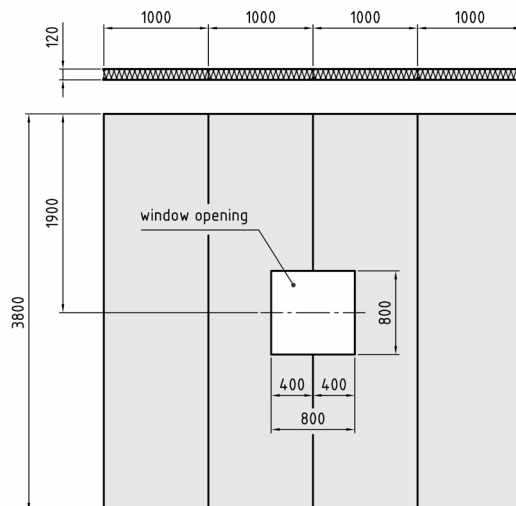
Interconnection system of four sandwich panels with large window opening positioned centrally across two inner panels
